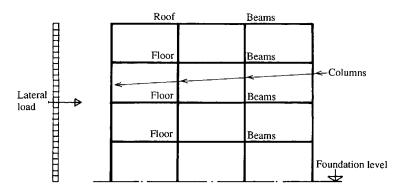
Unbraced frame; lateral load must be resisted and transmitted down to the foundations by interaction between the beam and column frame members
